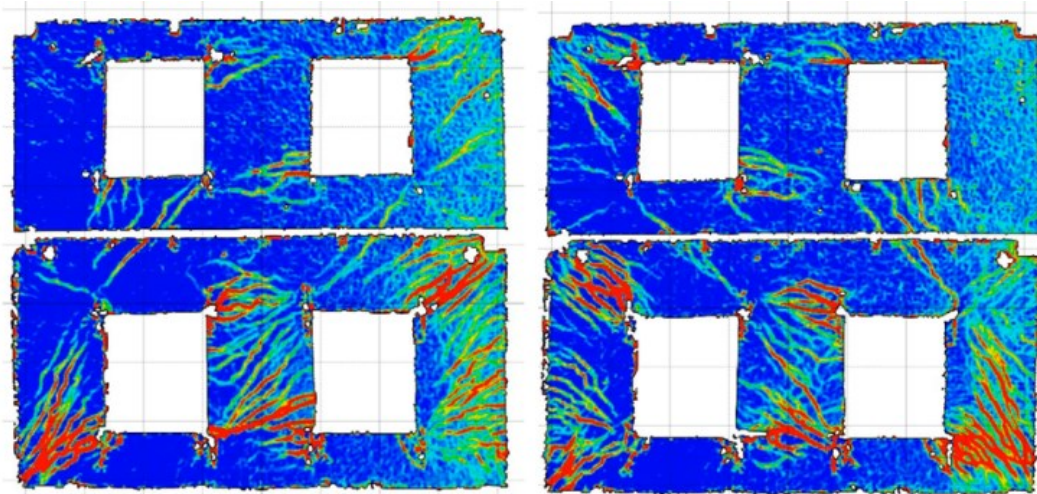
Cracks on the East wall obtained by the DIC system. Red lines denote cracks. Damage when loaded in negative (left) and positive (right) directions.
